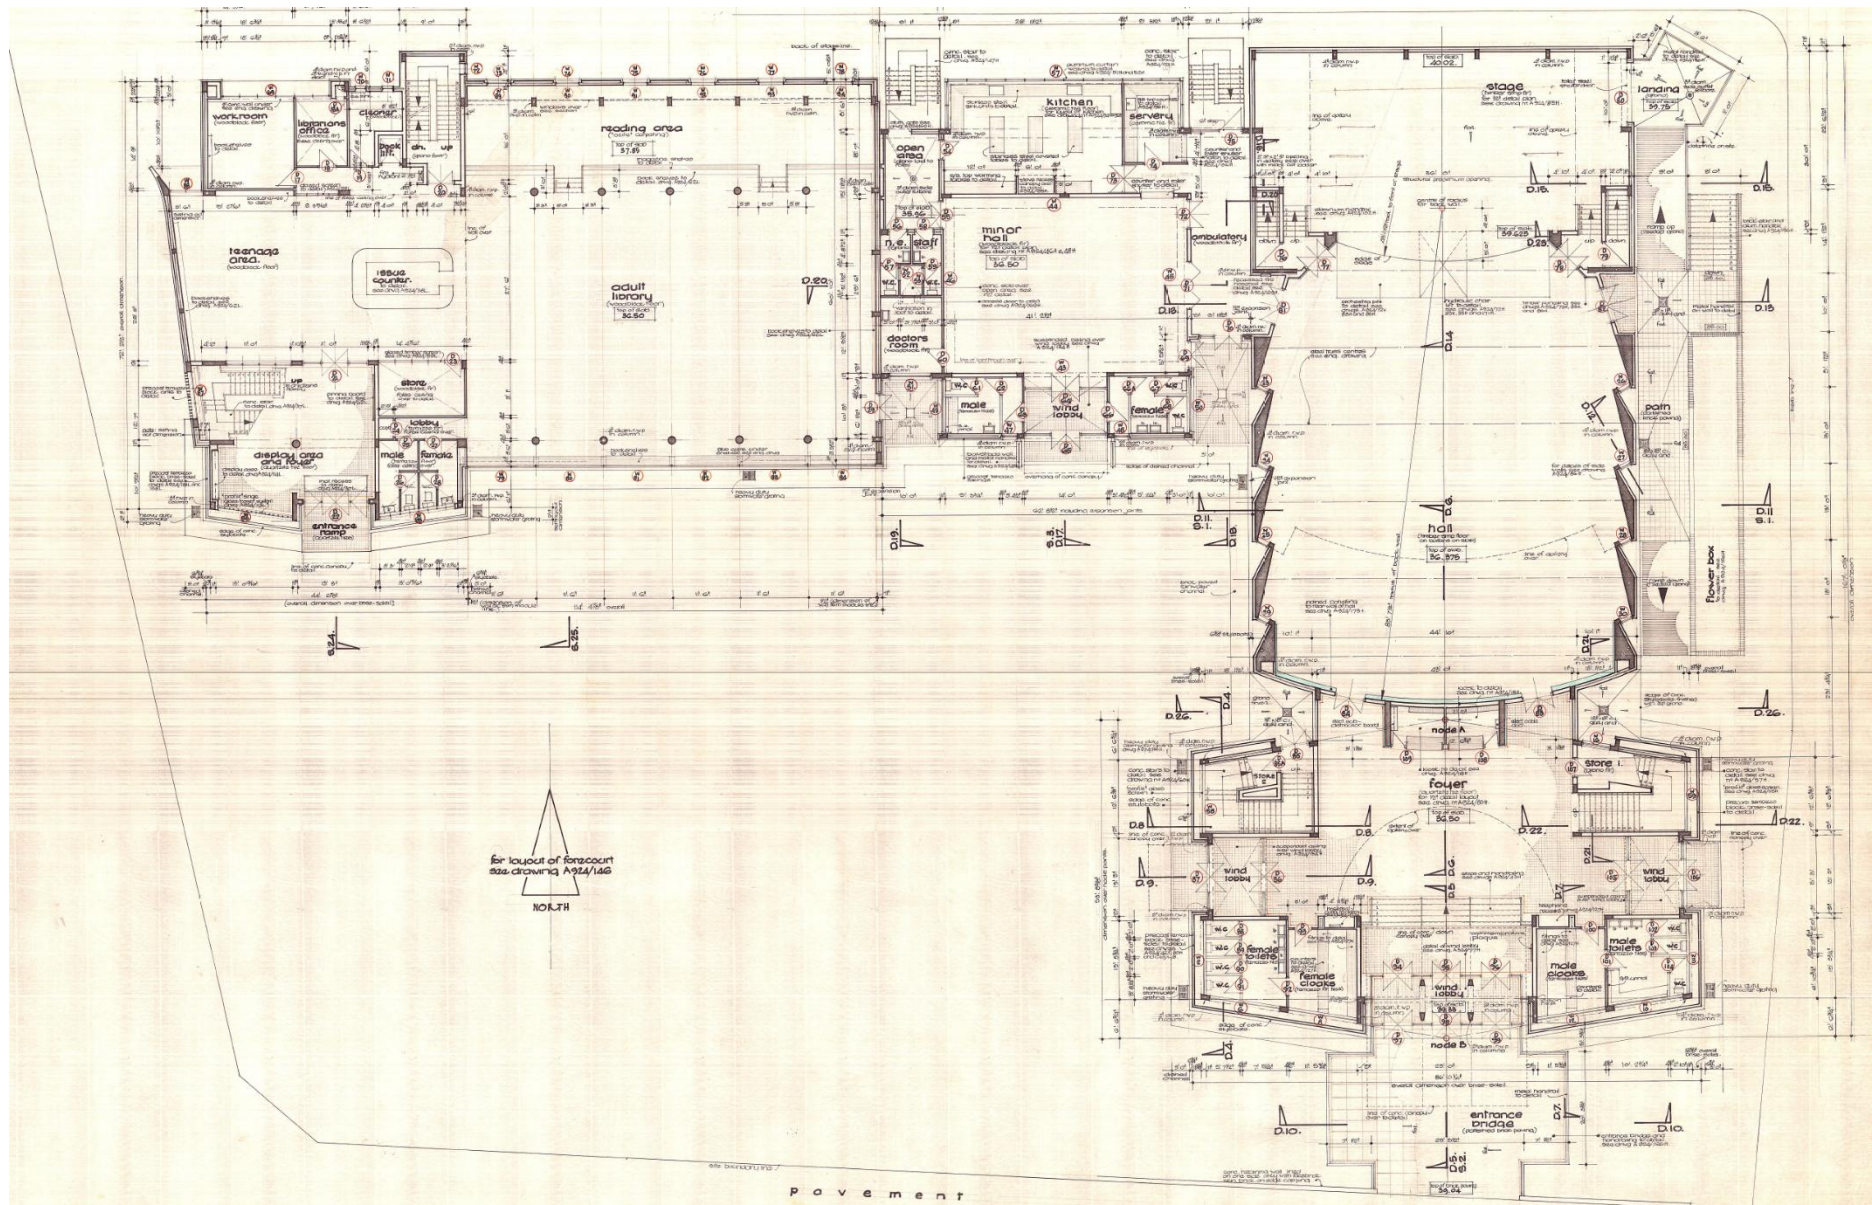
Extract from ground floor plan of the building (Working drawing A924/87 by DJ Greeff, 1969, designed by G Ramsay) (Source: CoCT)
